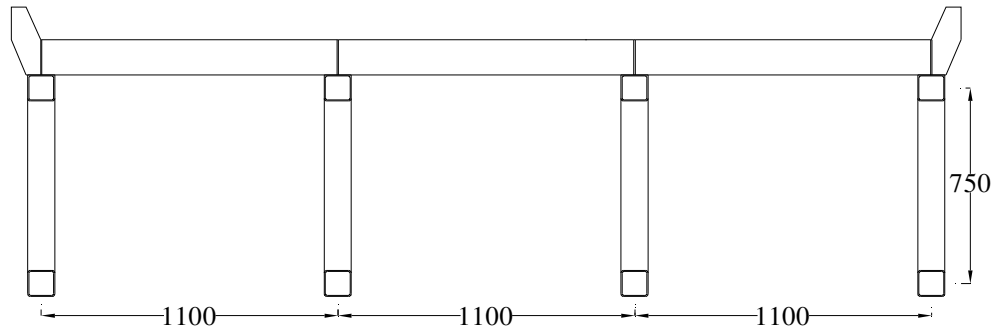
Cross section of steel bridge showing deck and stringer in mm
